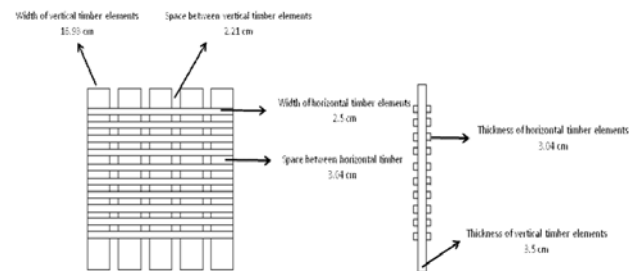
Detail for the timber structure of a typical interior tabique wall
